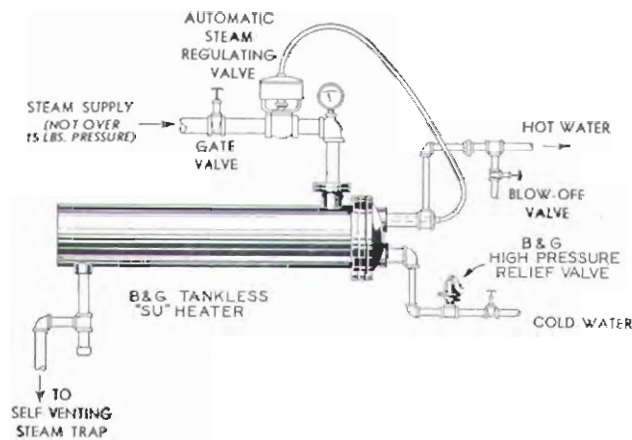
B & G Type "SU" Heater using low pressure steam.
